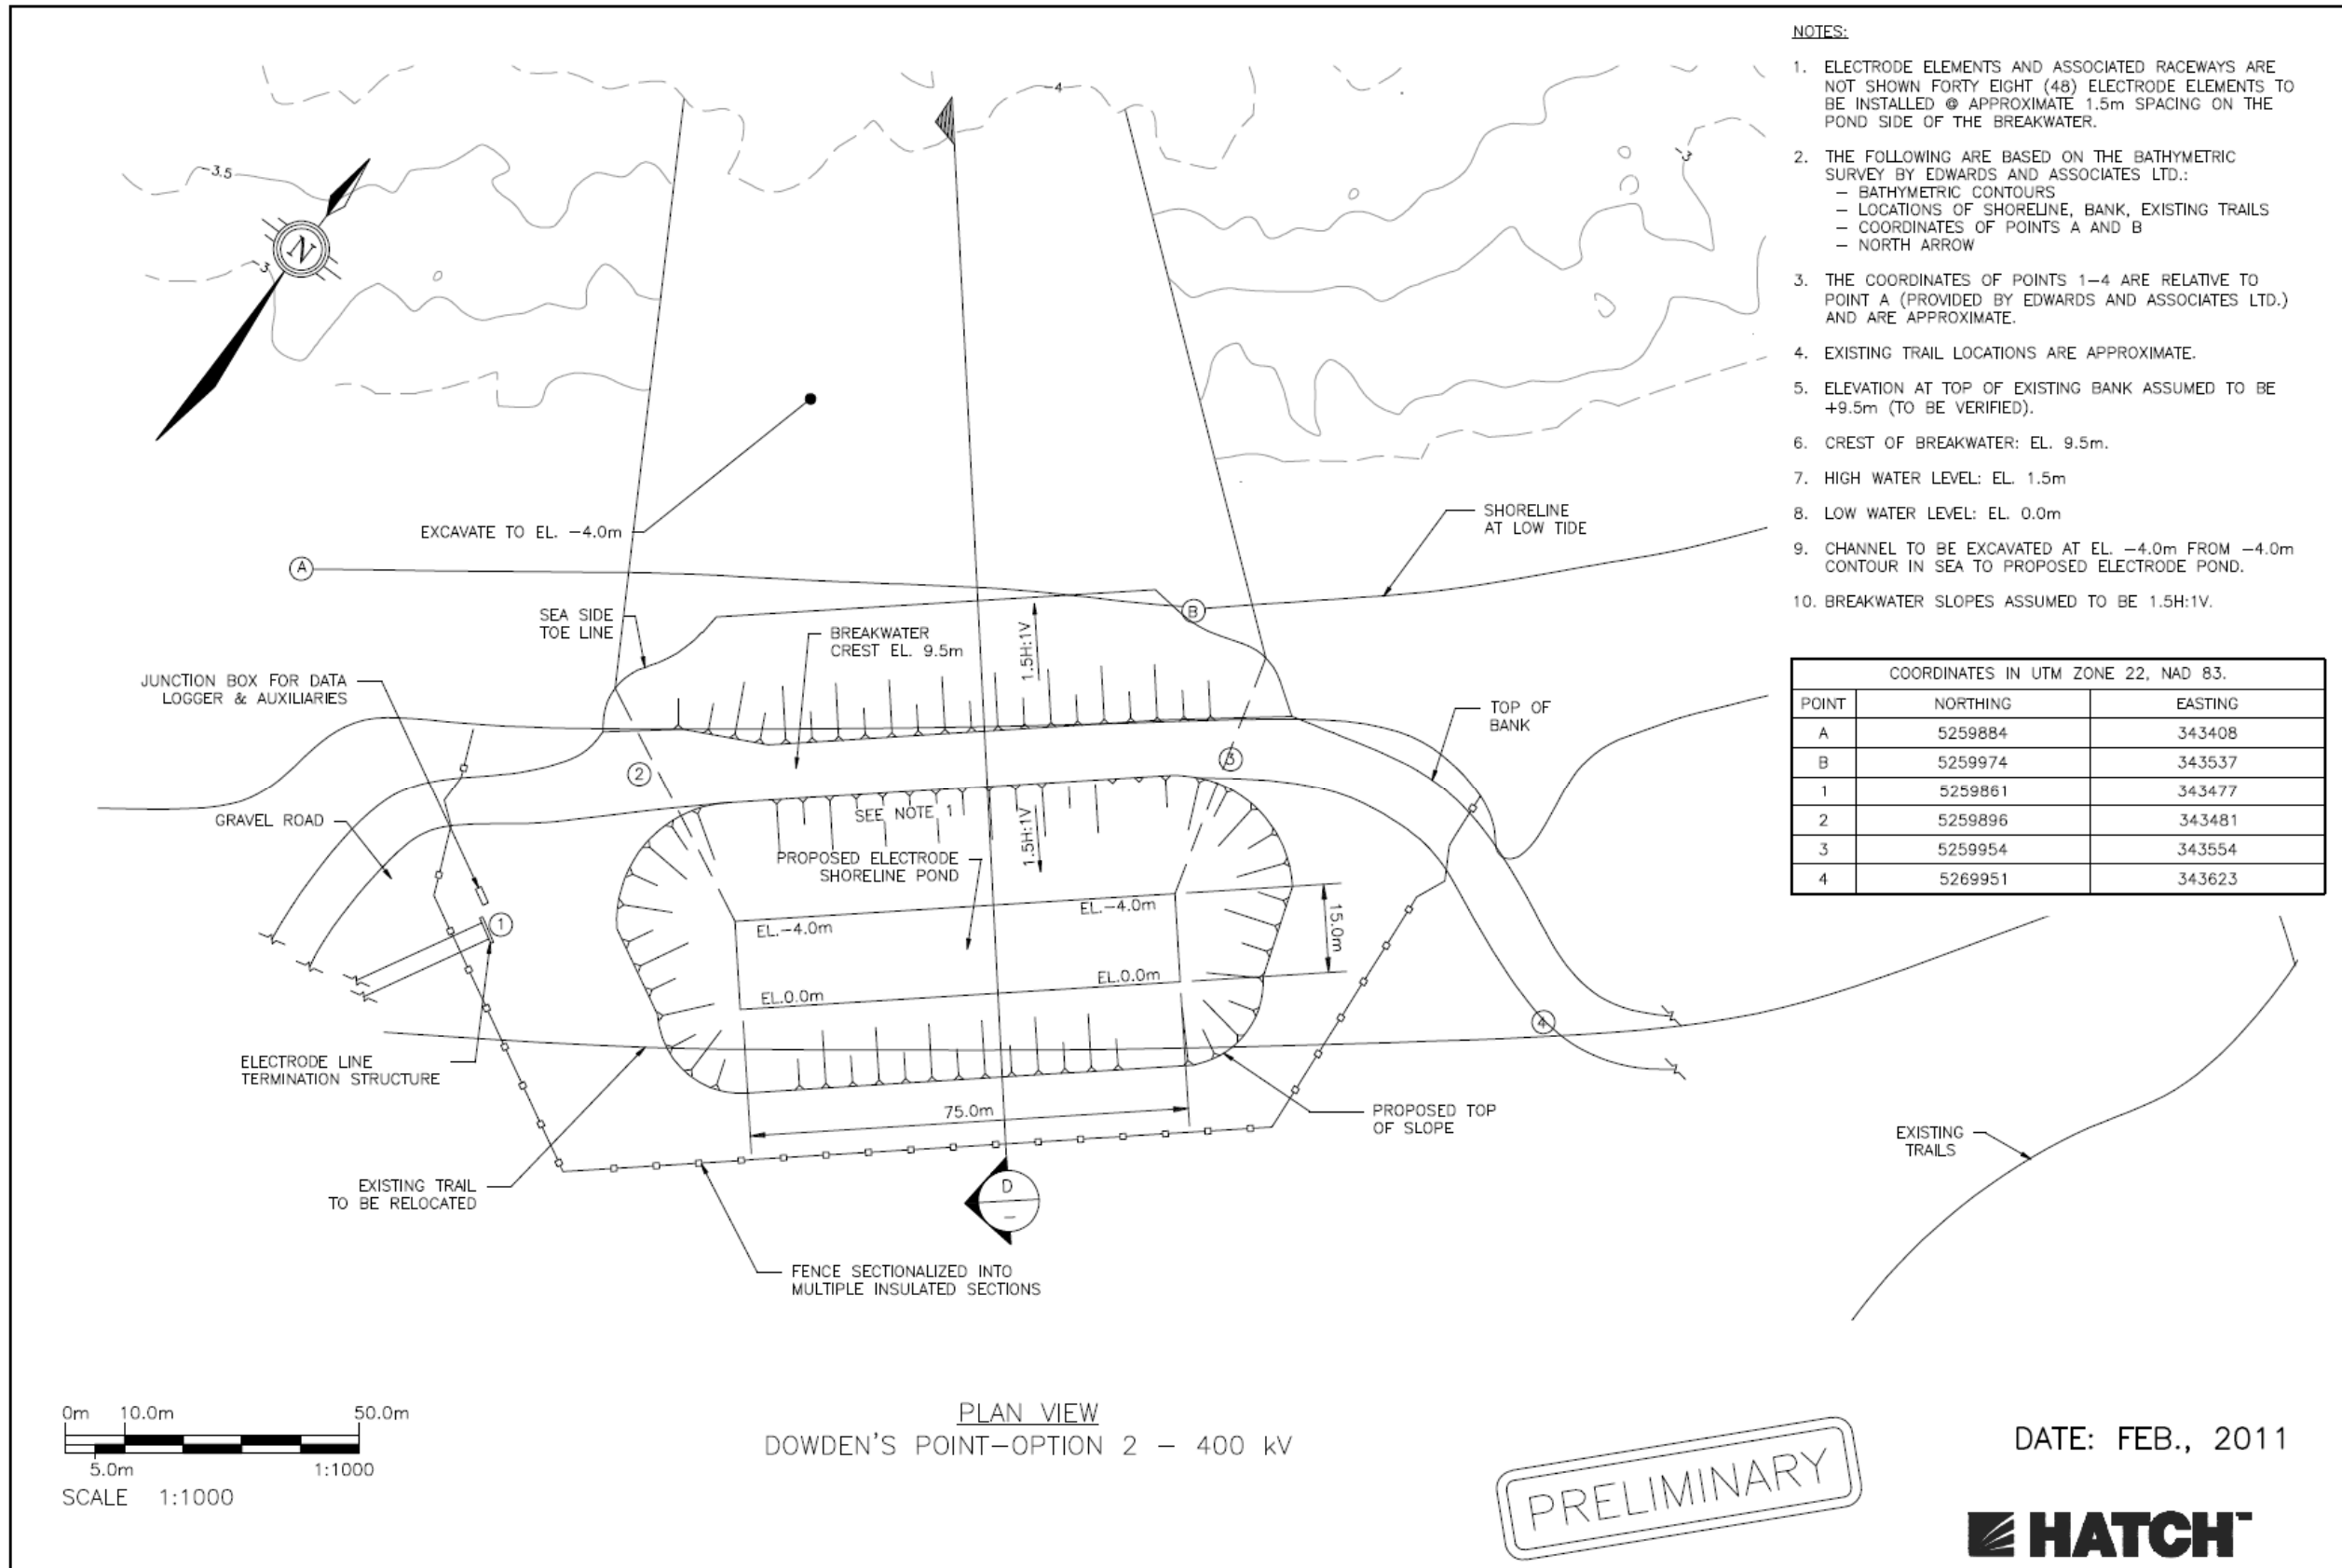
Dowden's Point Shoreline Pond and Breakwater Plan – Option 2, 400 kV Scenario
